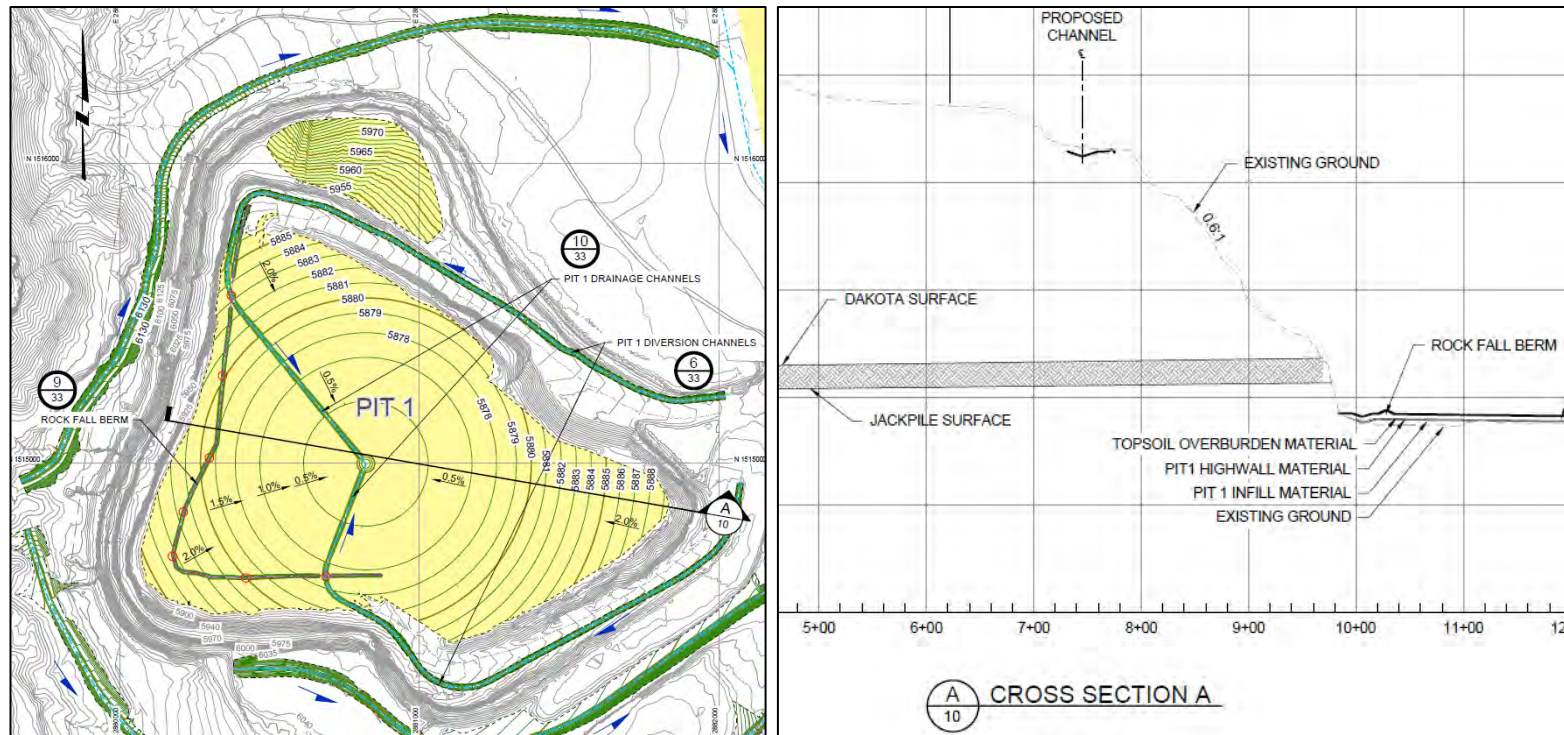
Pit 1 Highwall Excavation and Stabilization
